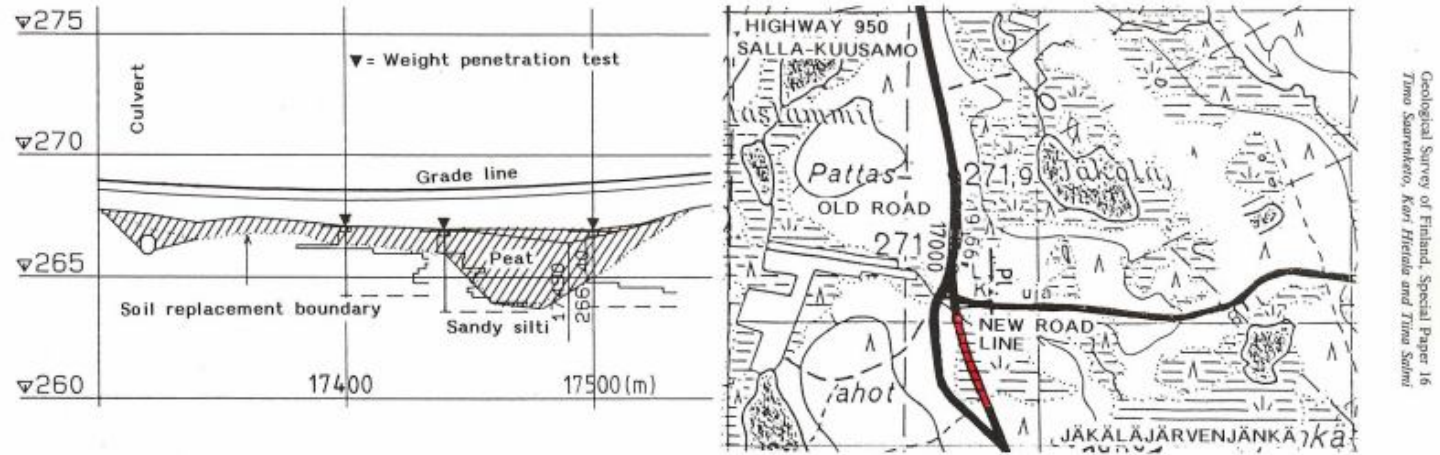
Jäkäläjärvenjäkä site investigations and the subgrade strengthening plan for highway 950, Salla, Kuusamo.
